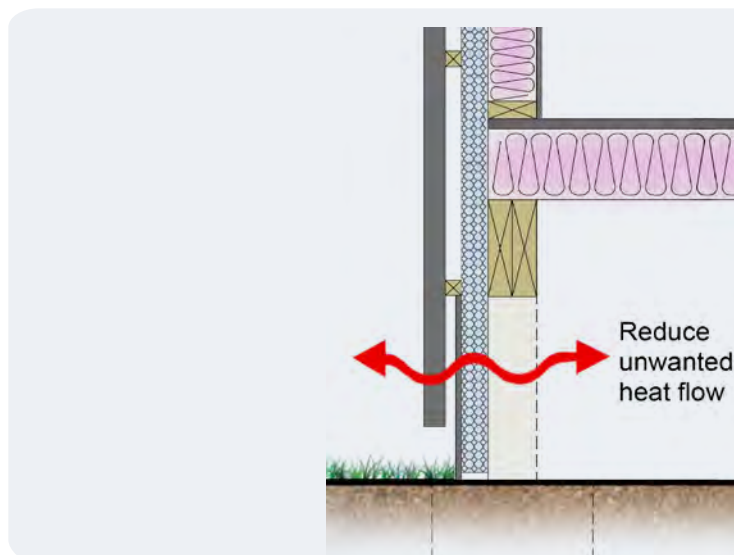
Insulation of sub-floor walls. Continue insulation to ground in accordance with manufacturer's detailing.
